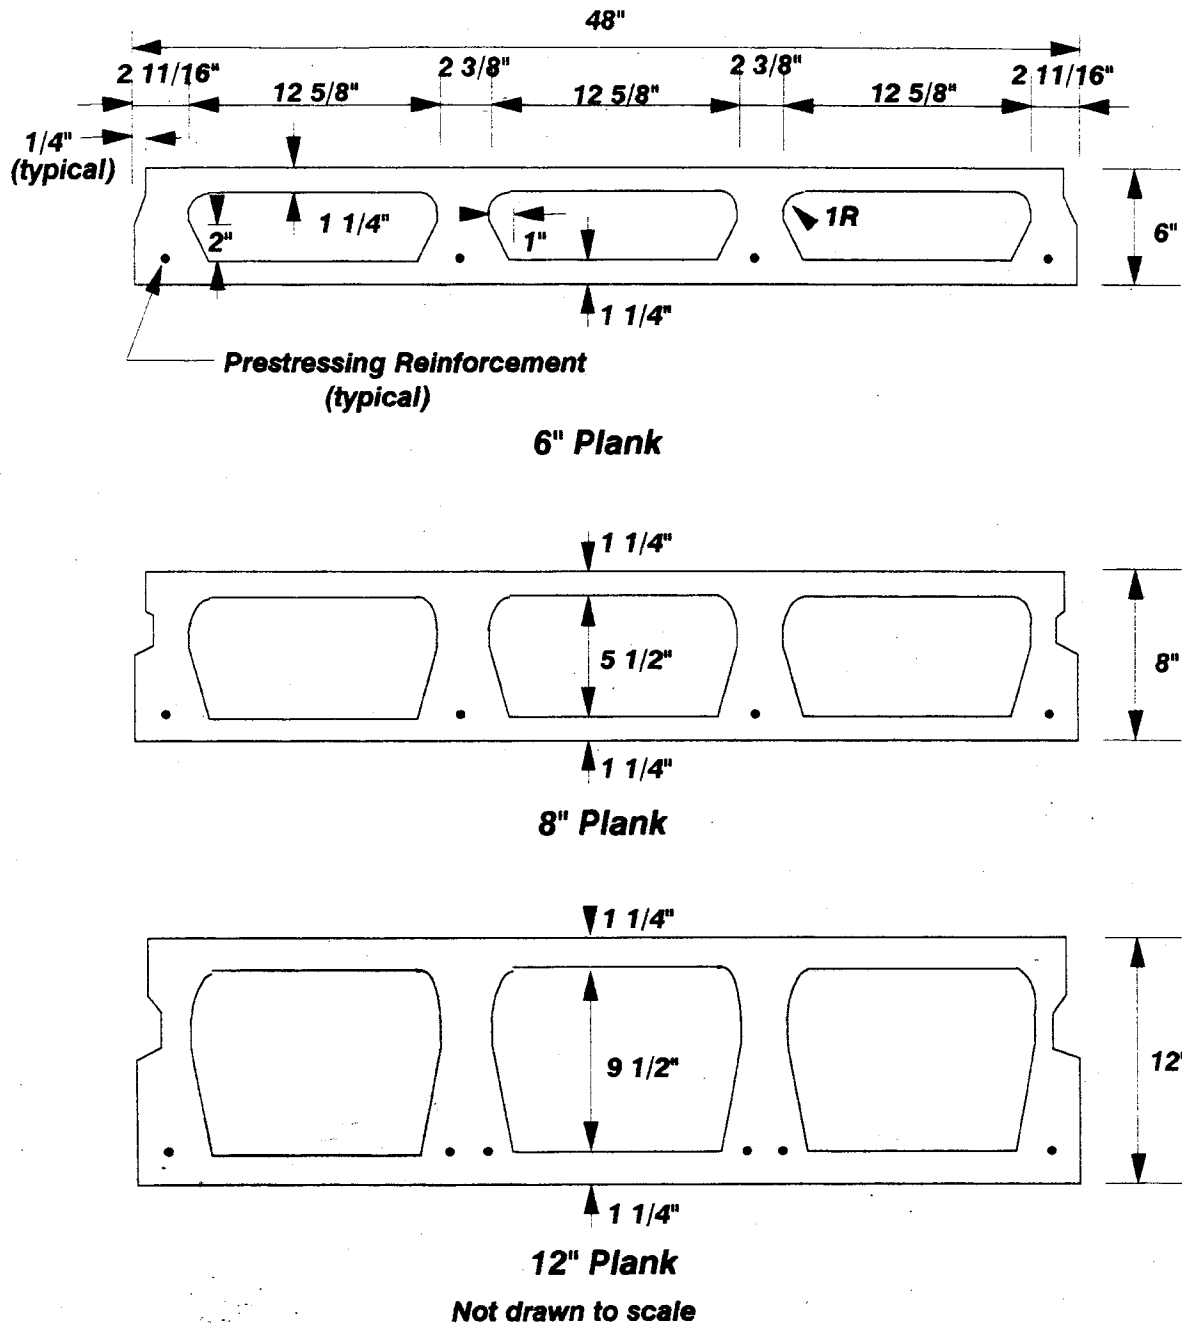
Cross-sectional views of 6-, 8-, and 12-inch Span-deck planks
